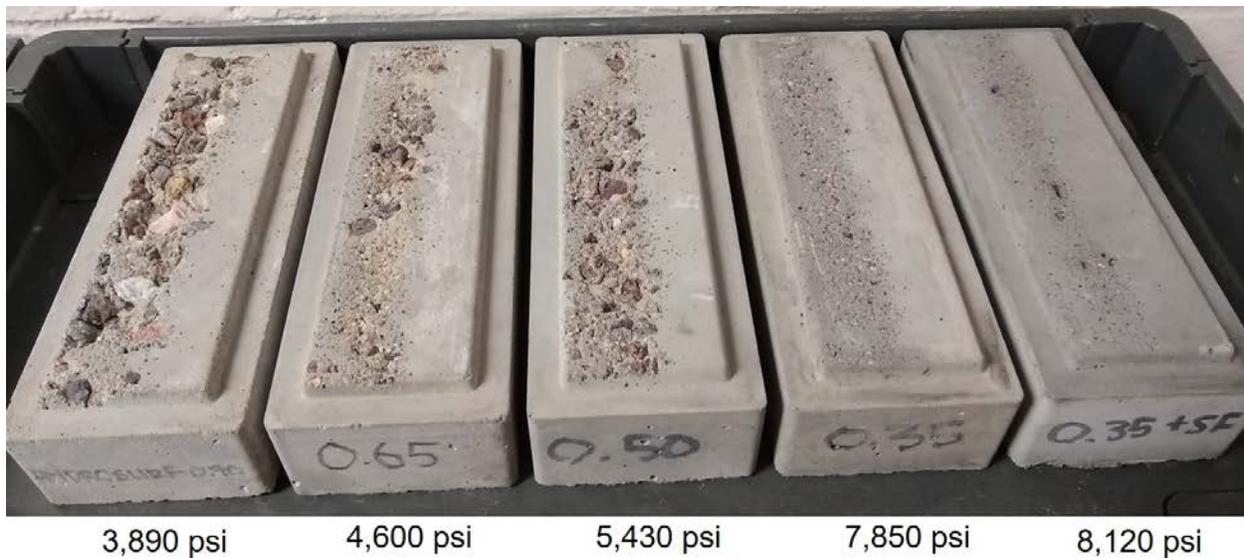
Photographs showing extent of cavitation damage with concrete strength to concrete test blocks with no air injection.
